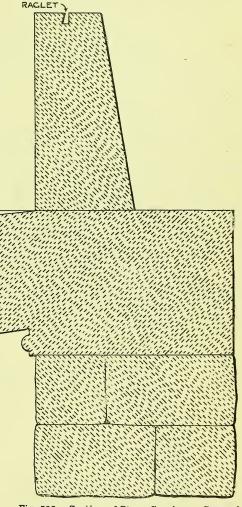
Section of Stone Cornice on Coursed Rubble Wall.
